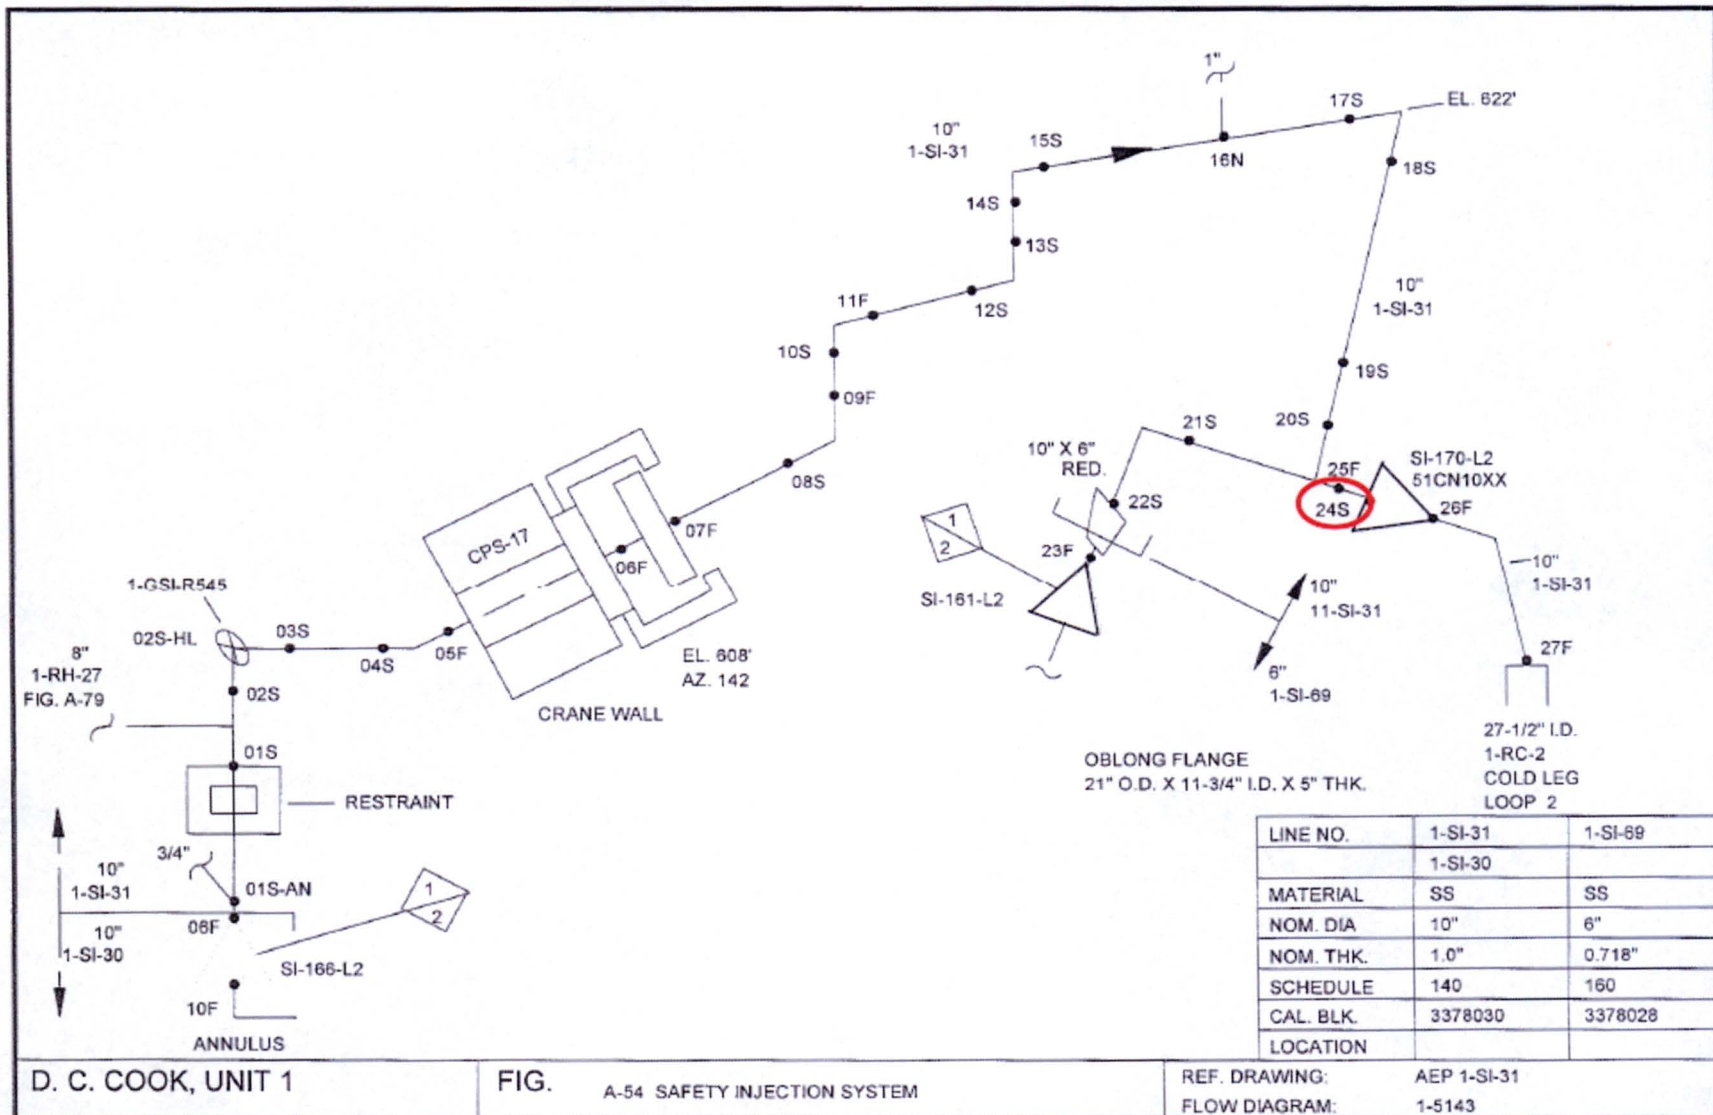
Weld 1-SI-31-24S (Extracted from Reference DRAWING A-54)
